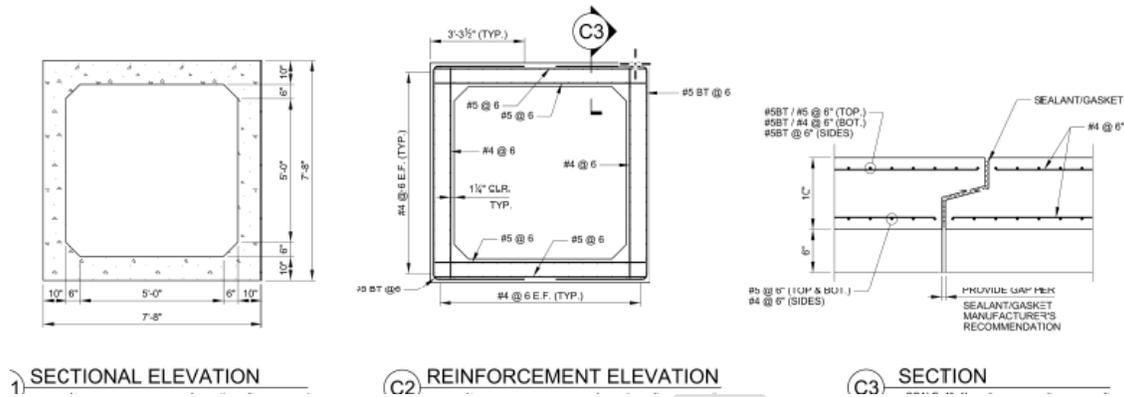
Sample drawings of different sections and details of a reinforced concrete box culvert
